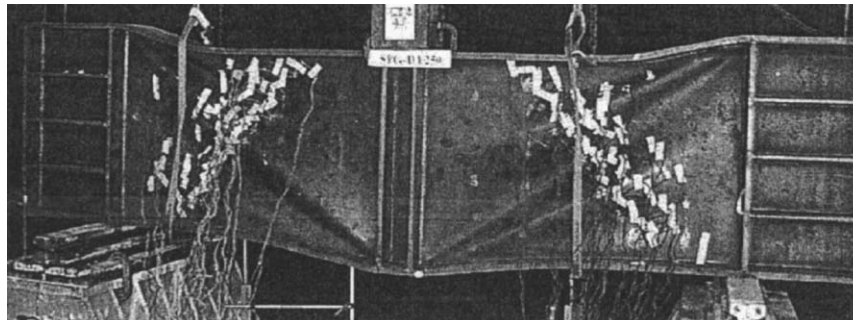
View after failure of a 2-panel girder [41].
